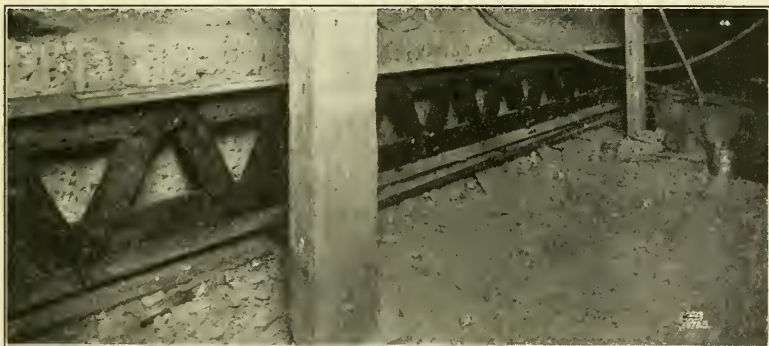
LONGITUDINAL LATTICE GIRDER BEING ERECTED AND FASTENED IN PLACE.
